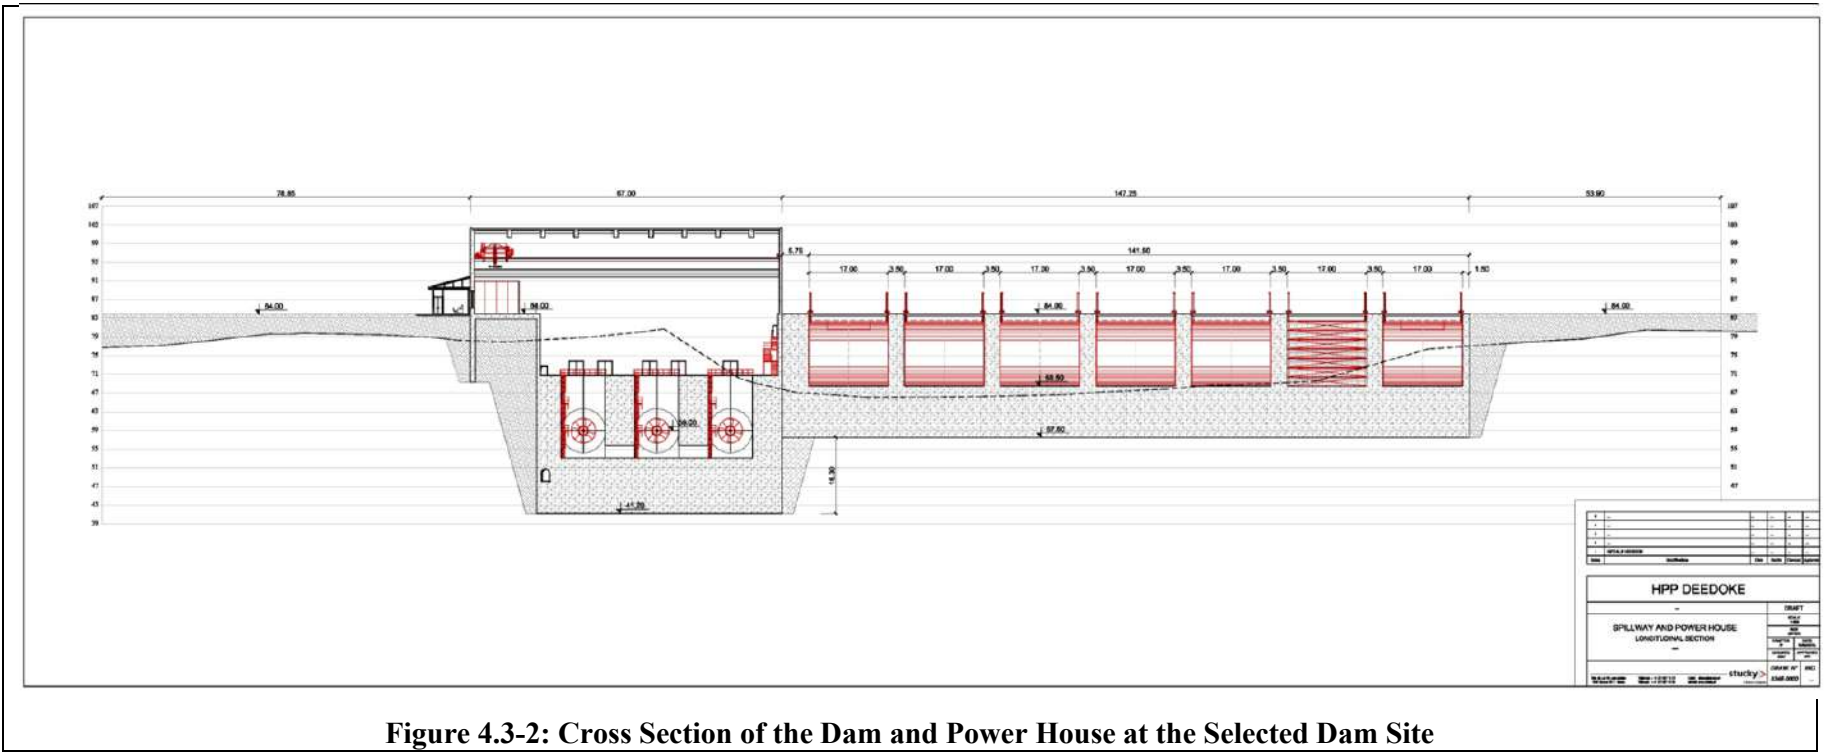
Cross Section of the Dam and Power House at the Selected Dam Site
